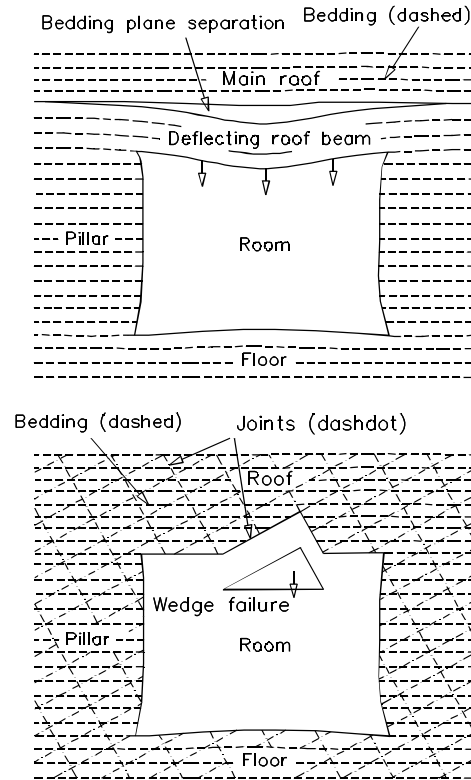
Two different modes of roof rock failure that are common in underground stone mines.
